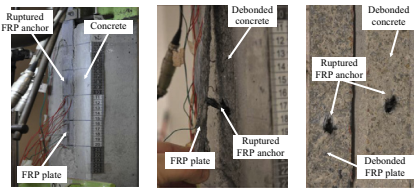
Typical anchored joint failure (Specimen A3-1).
